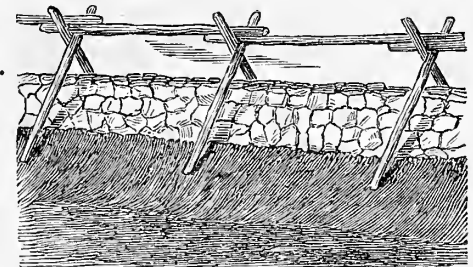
LONGITUDINAL VIEW OF STONE WALL.
